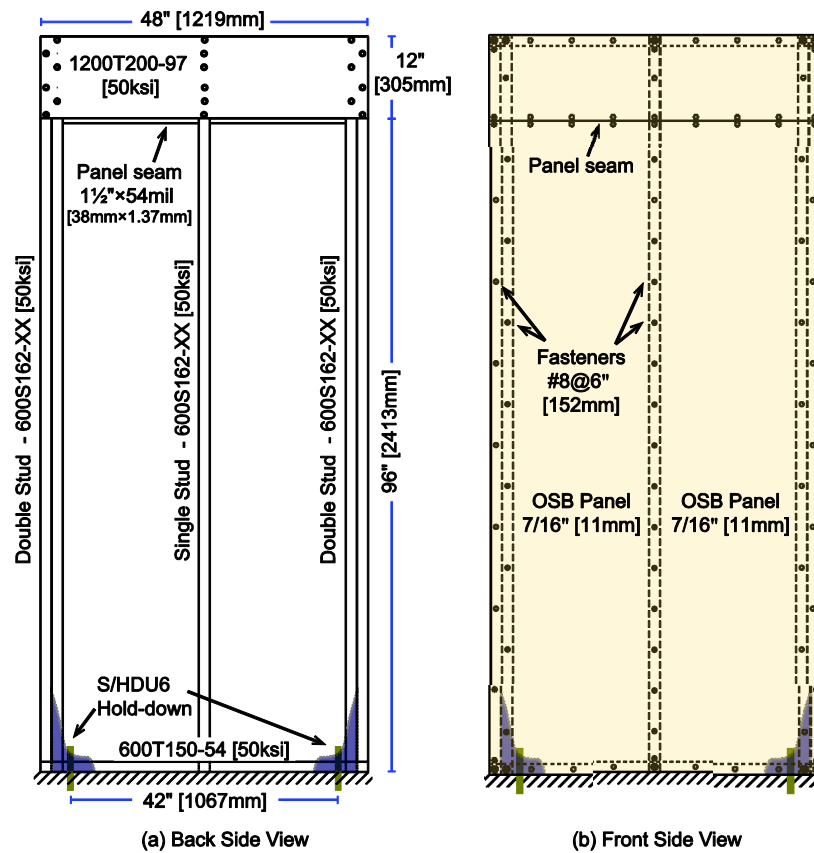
Cold-formed shear wall front and back side detail [12].
